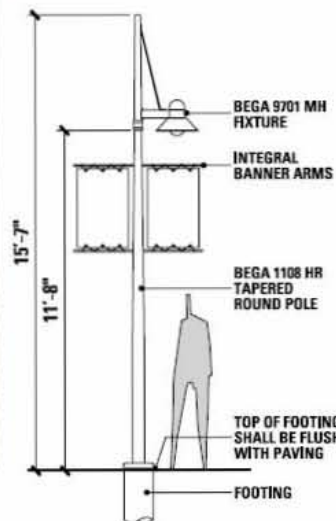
(Page 17 of 18) Streetscape Plan
